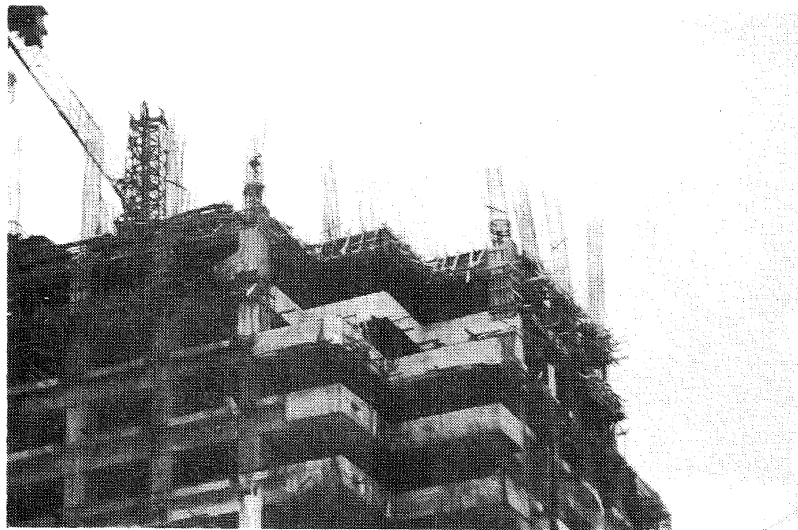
Multi-storey, cast insitu concrete frame, Manila; column and beam falsework and formwork
